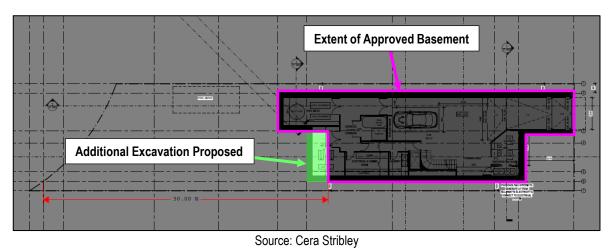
Proposed Basement Floor Plan Showing Additional Proposed Excavation
